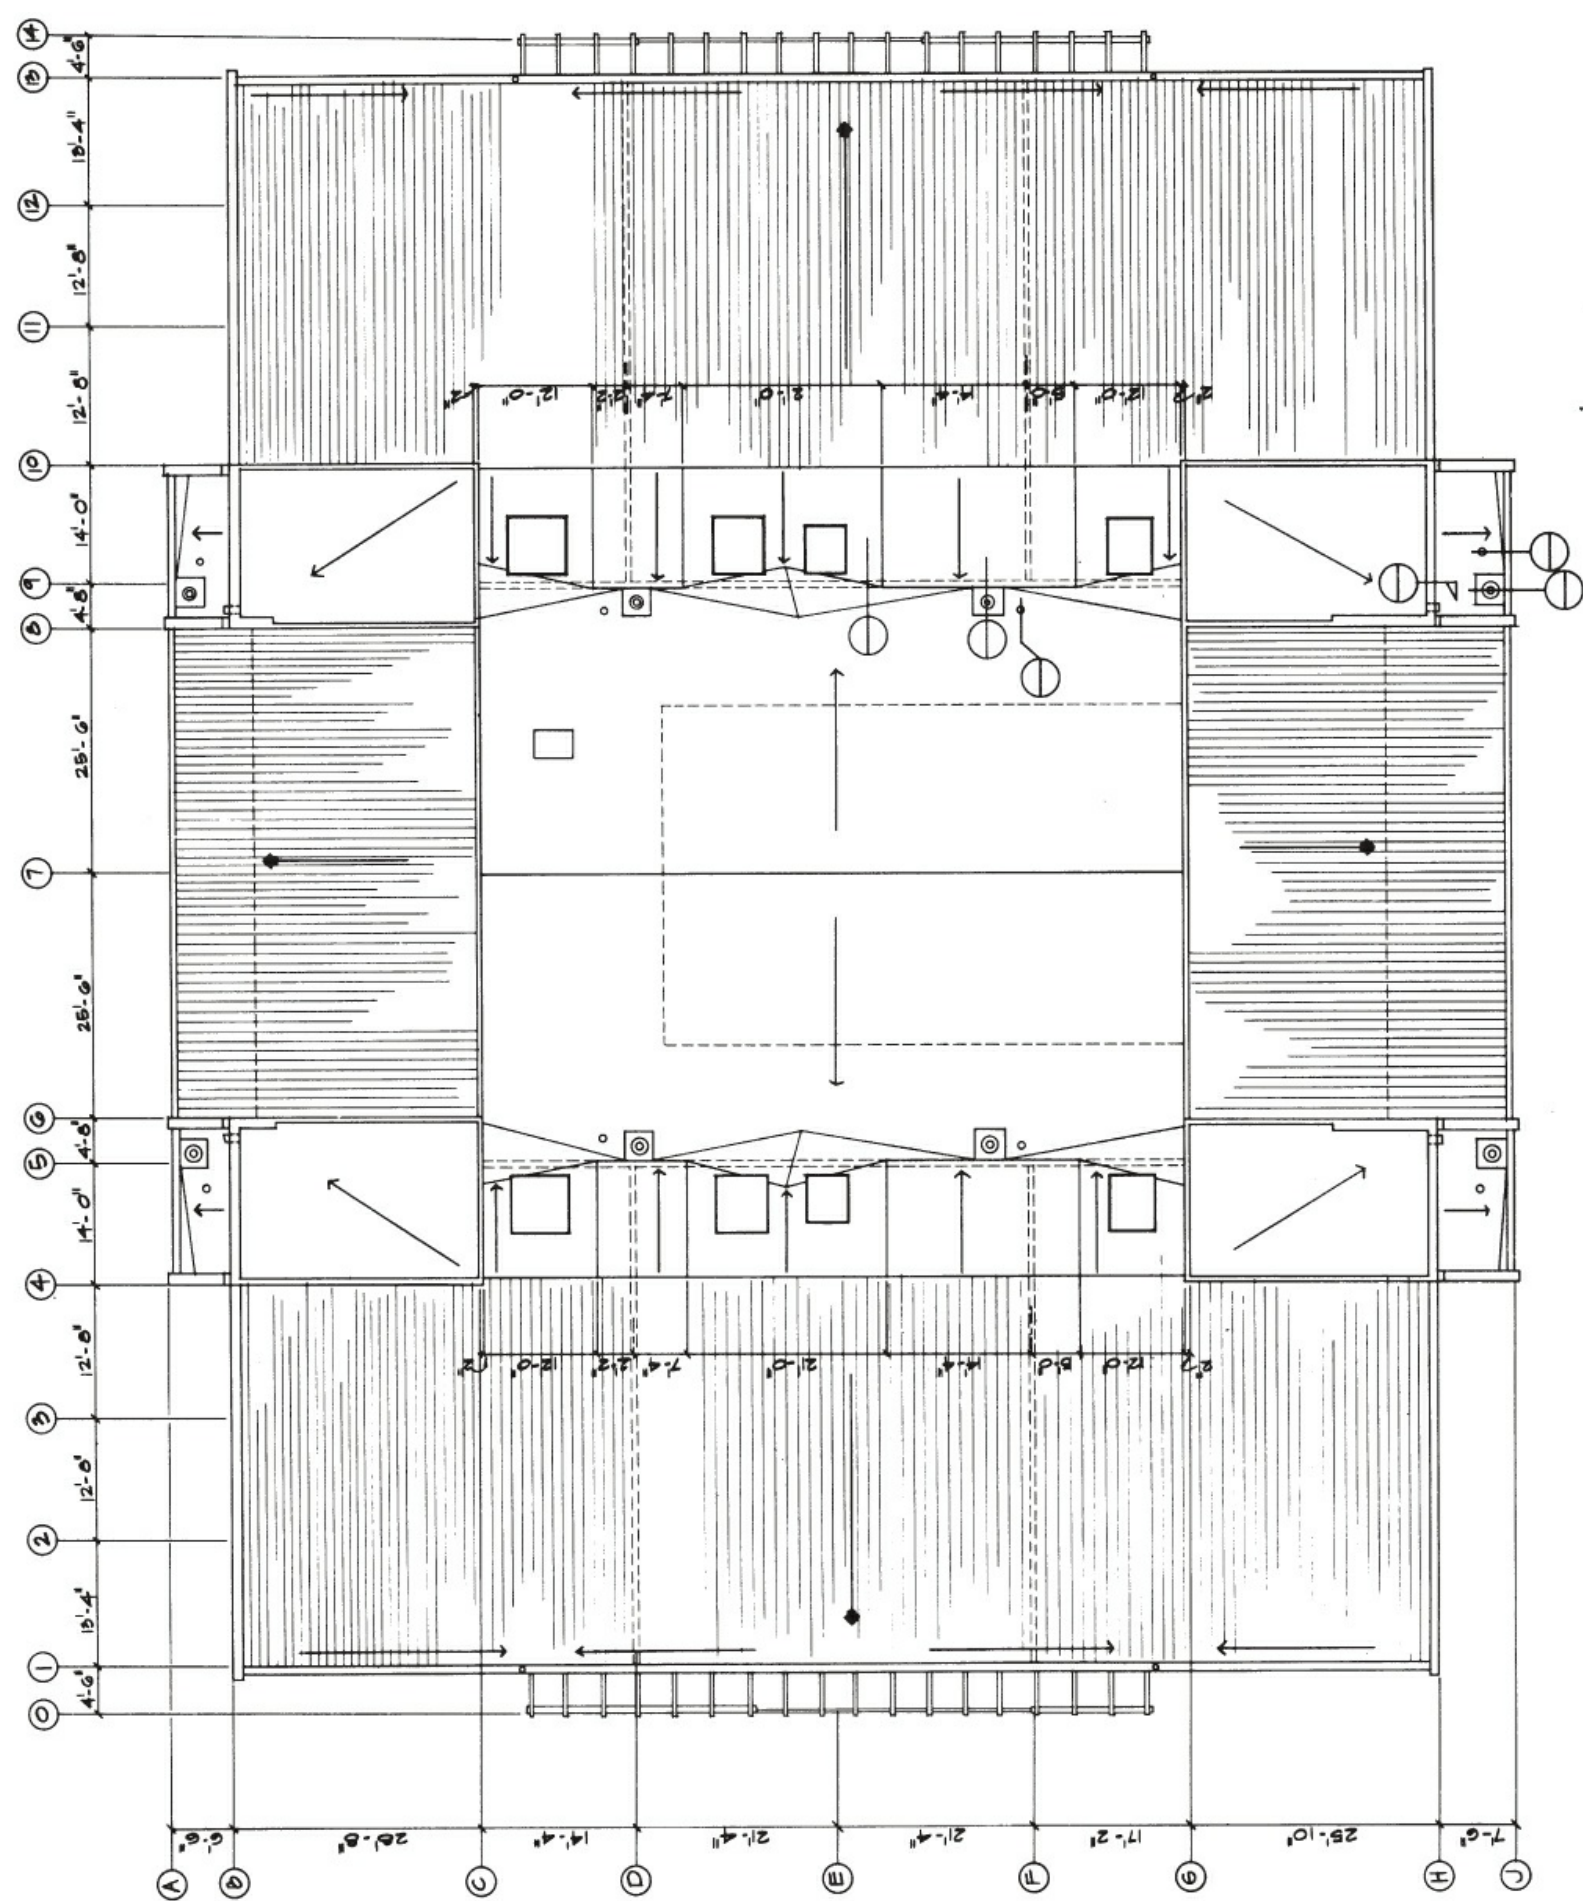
Clay Theater—Stage II: Working drawing—roof plan.
